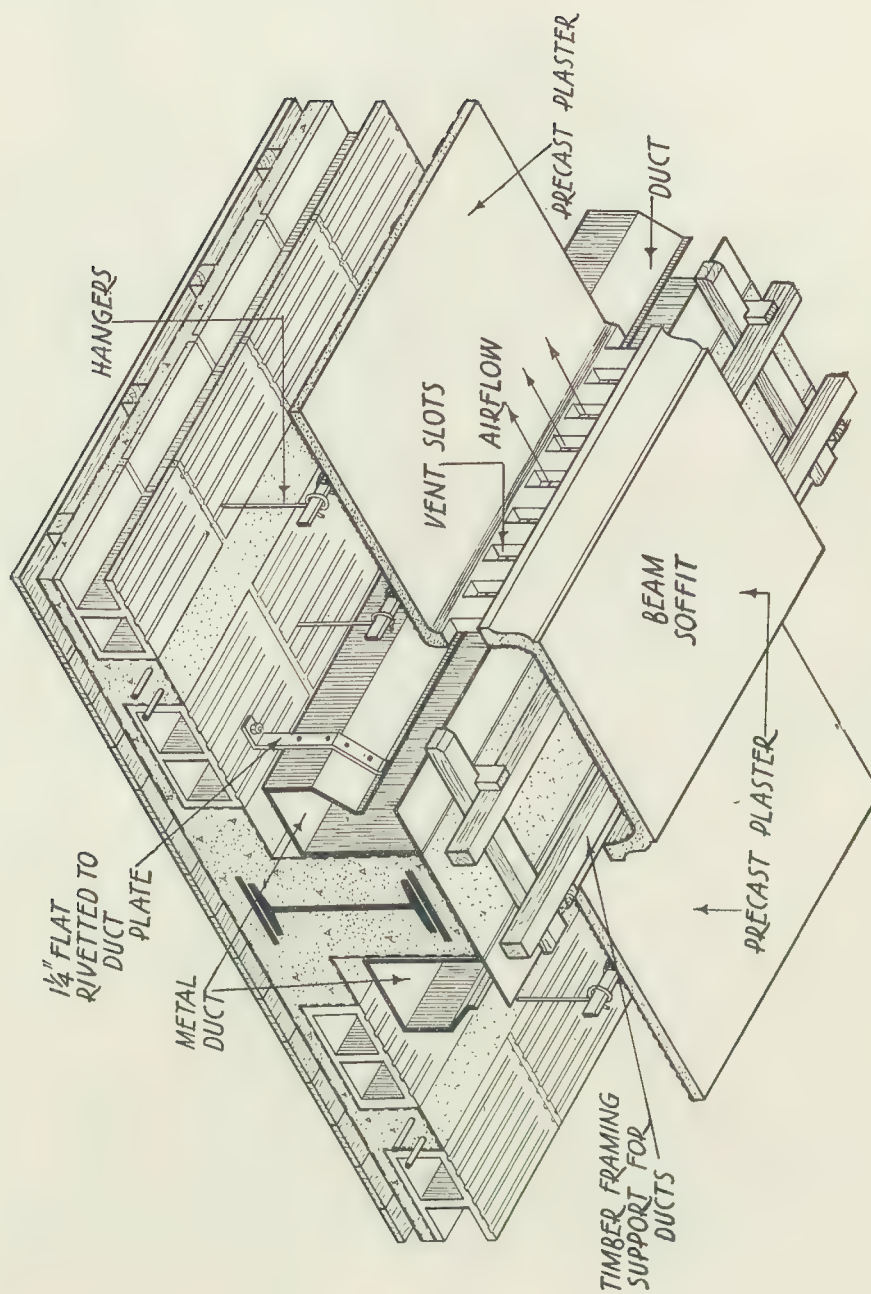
HOUSING VENTILATING DUCTS UNDER FLOOR SLABS
